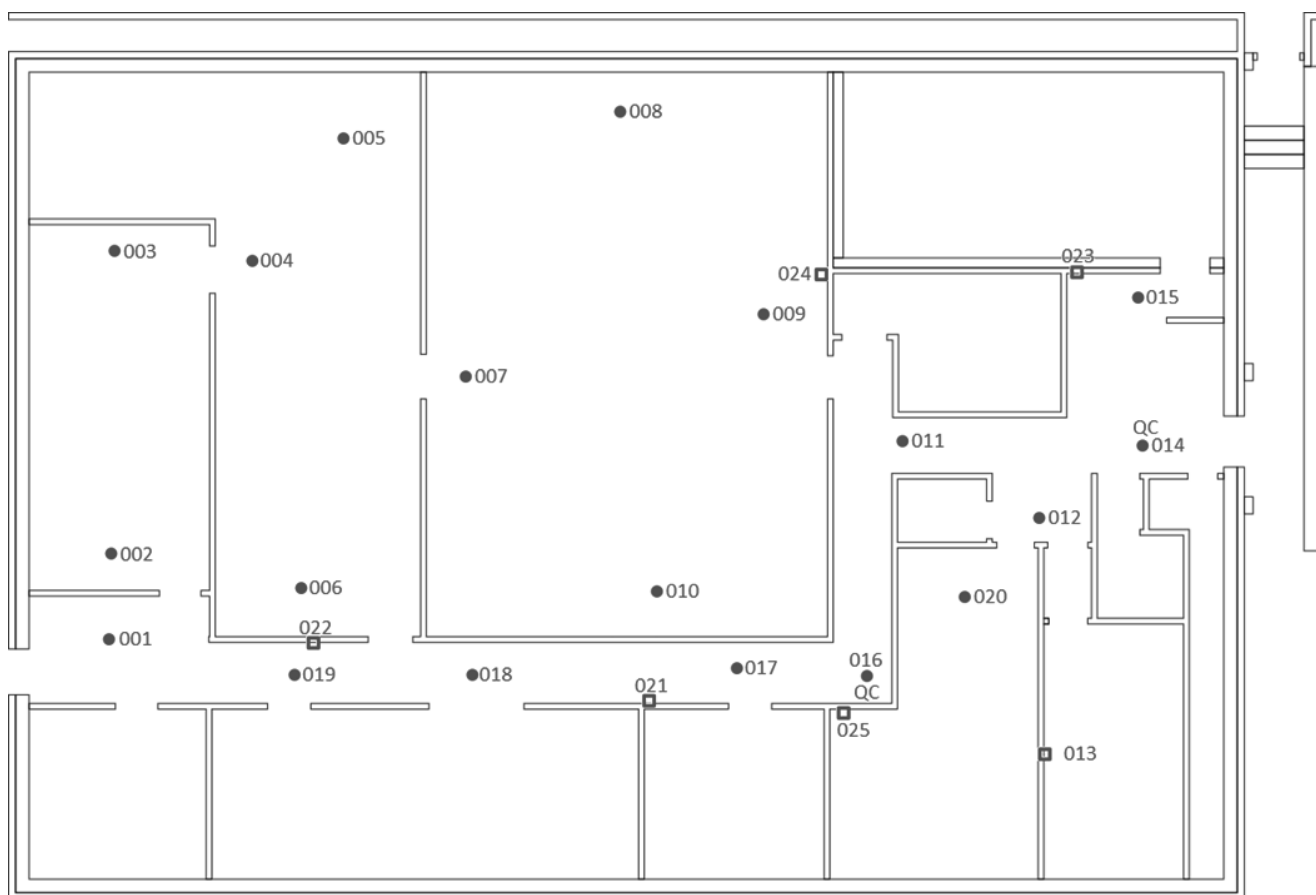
Maintenance Shop Second Floor Surface Measurement Locations
